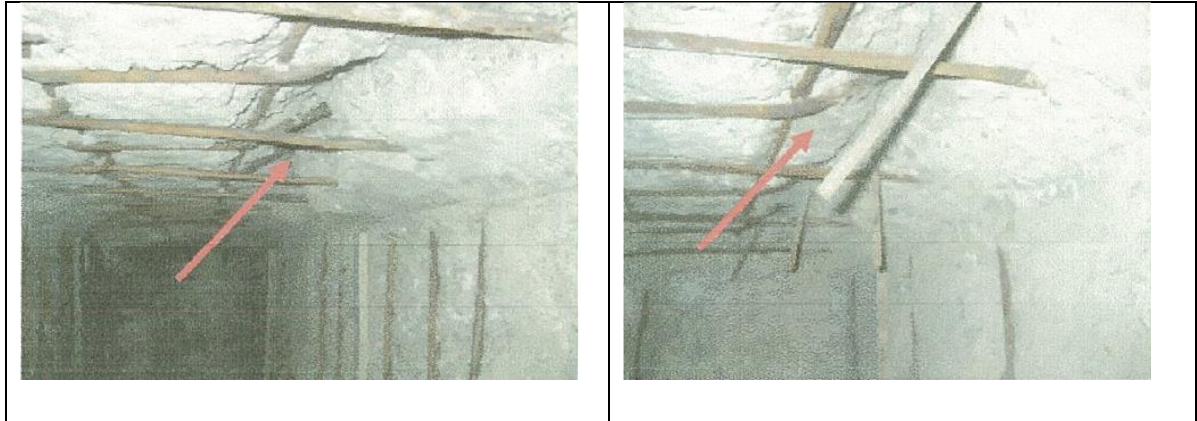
& VI-161) Crack in topping slab
